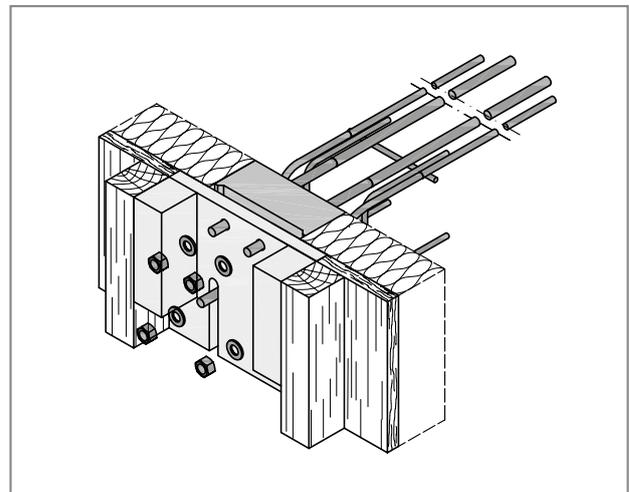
Schöck Isokorb® type KS: Installation aid installed in reverse to enable gapless insulation of the slab edge on monolithic walls.
